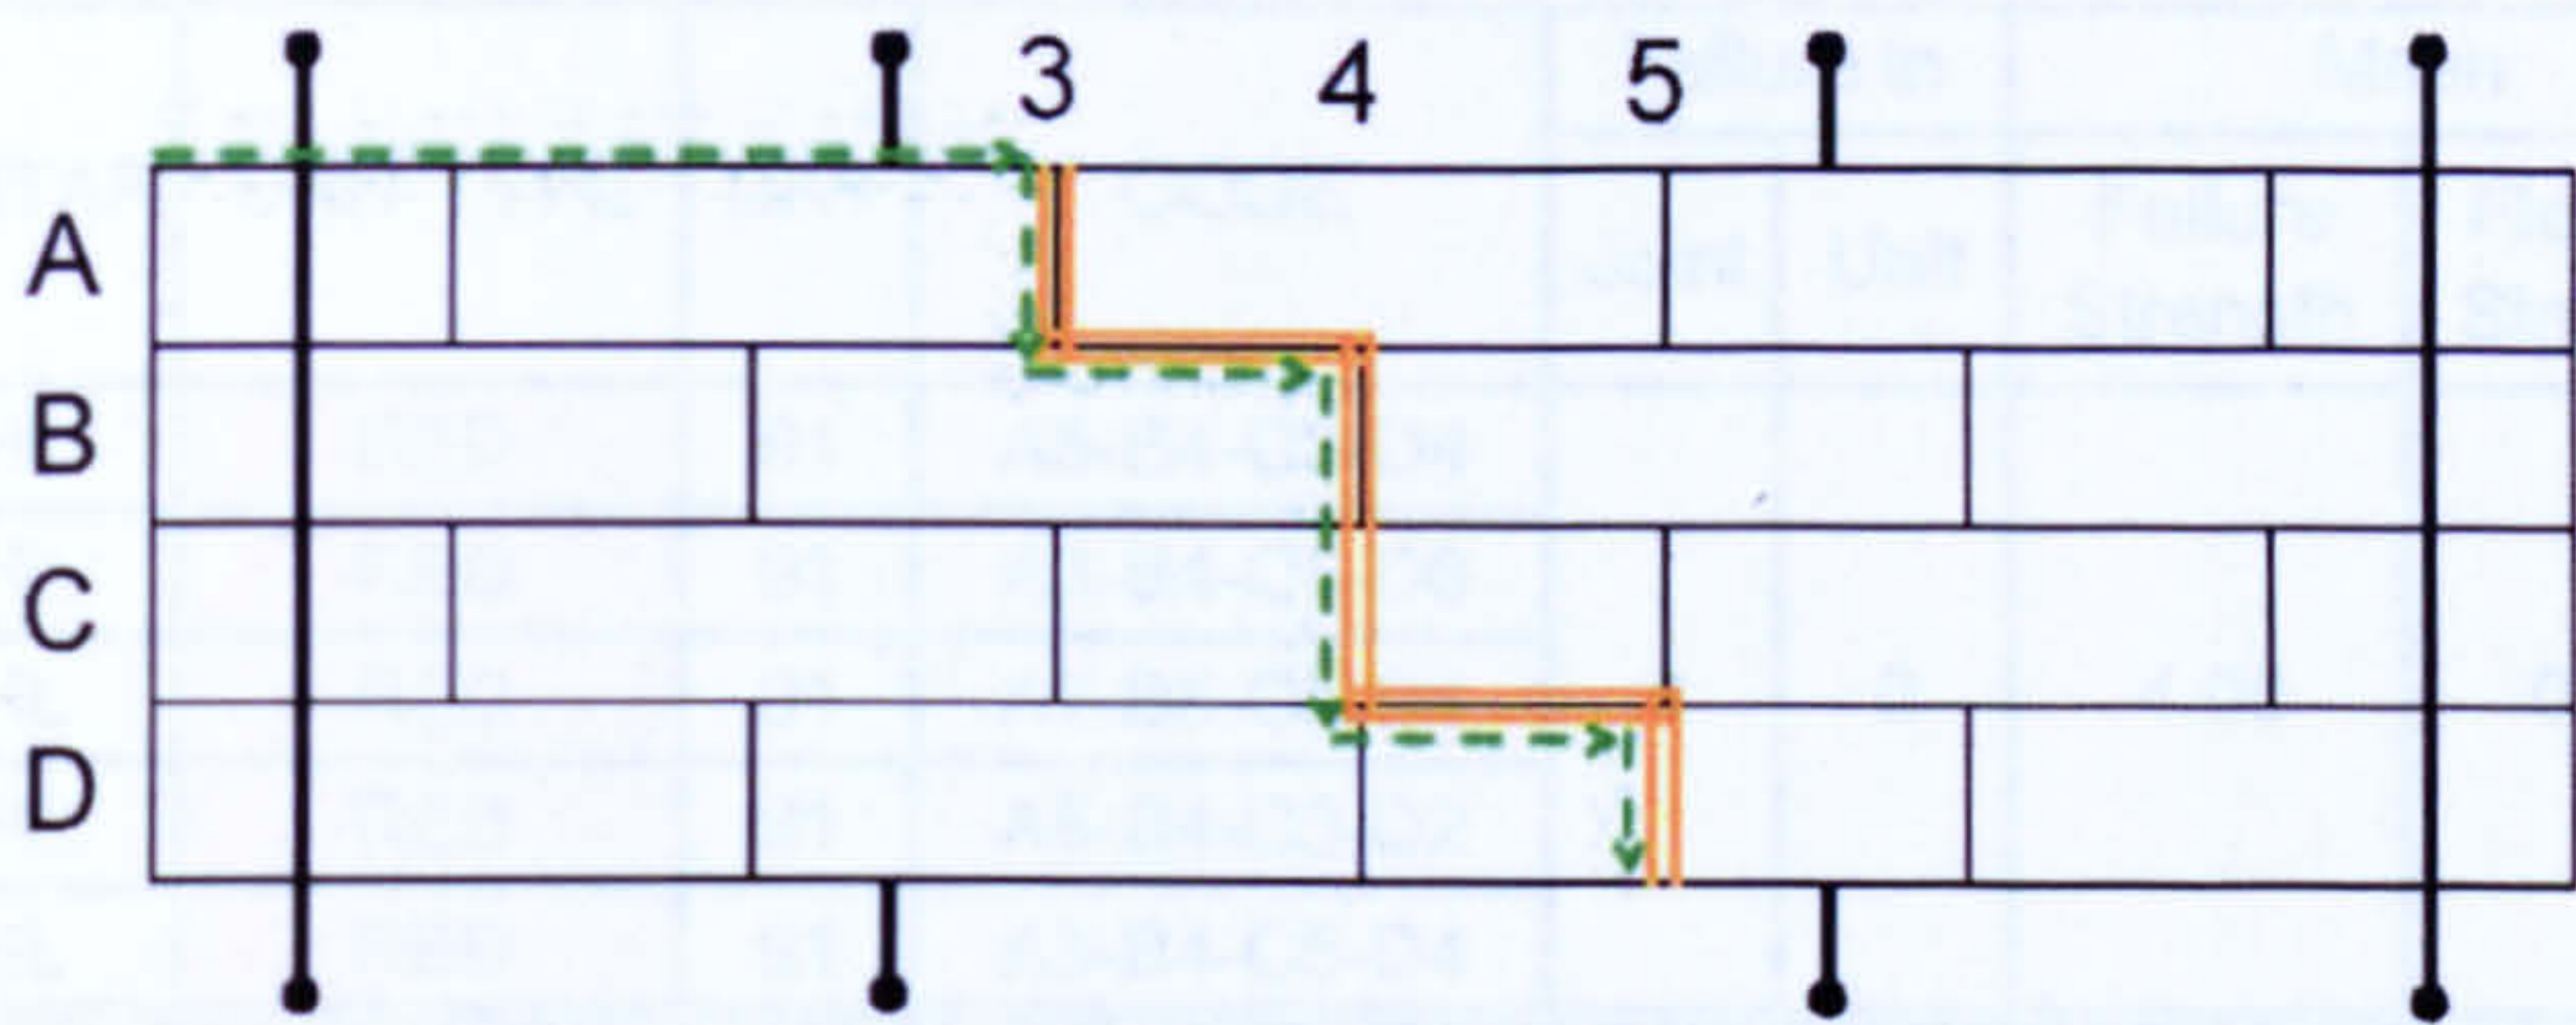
P wallettes – example wallette failure pattern
